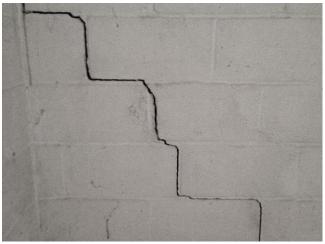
Wall Cracking (Taken by author, 2016)
